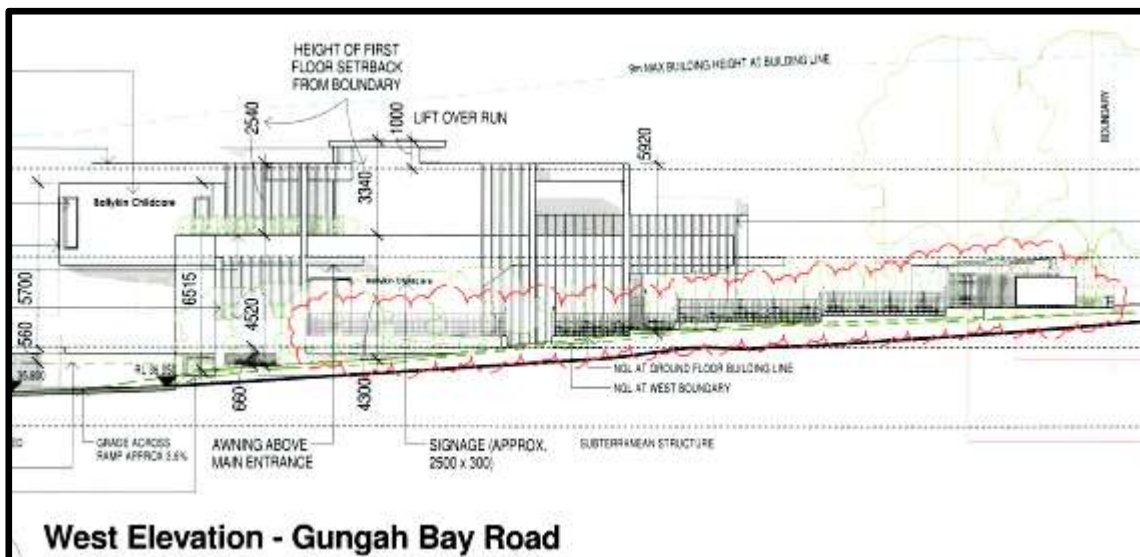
Western elevation of the approved centre – Gungah Bay Road frontage
